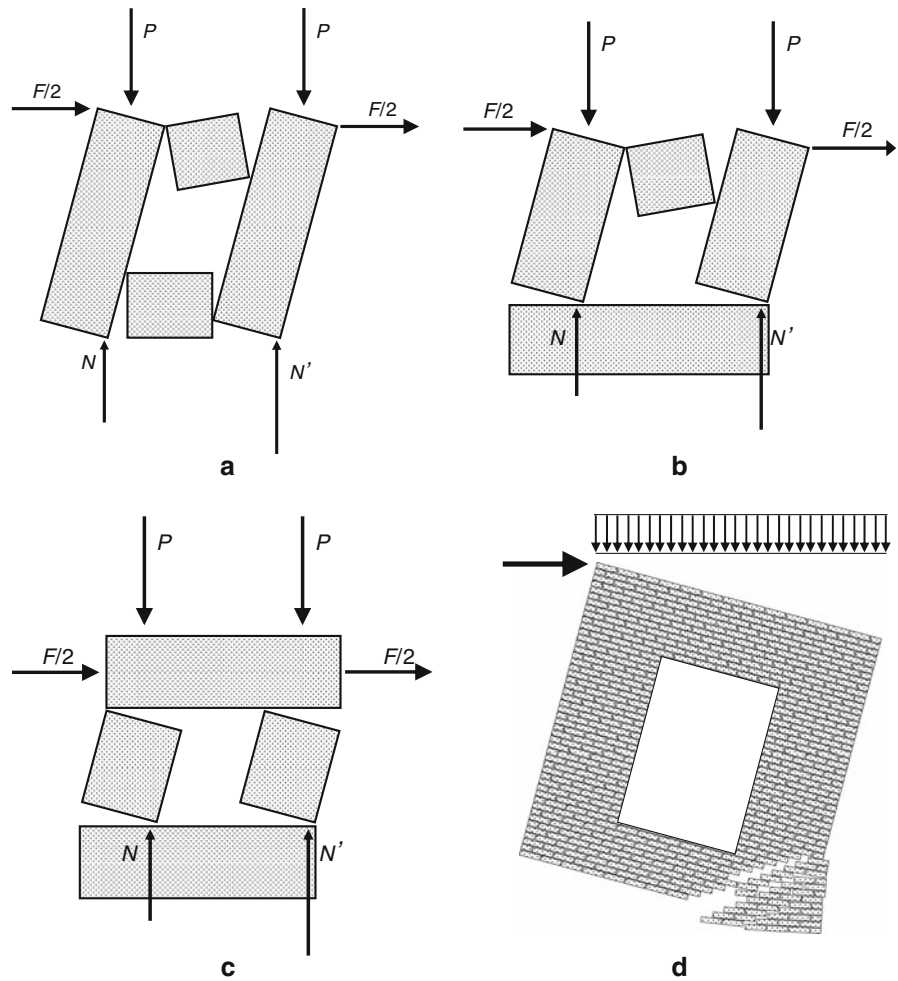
Sliding failure mode of unreinforced masonry perforated wall
